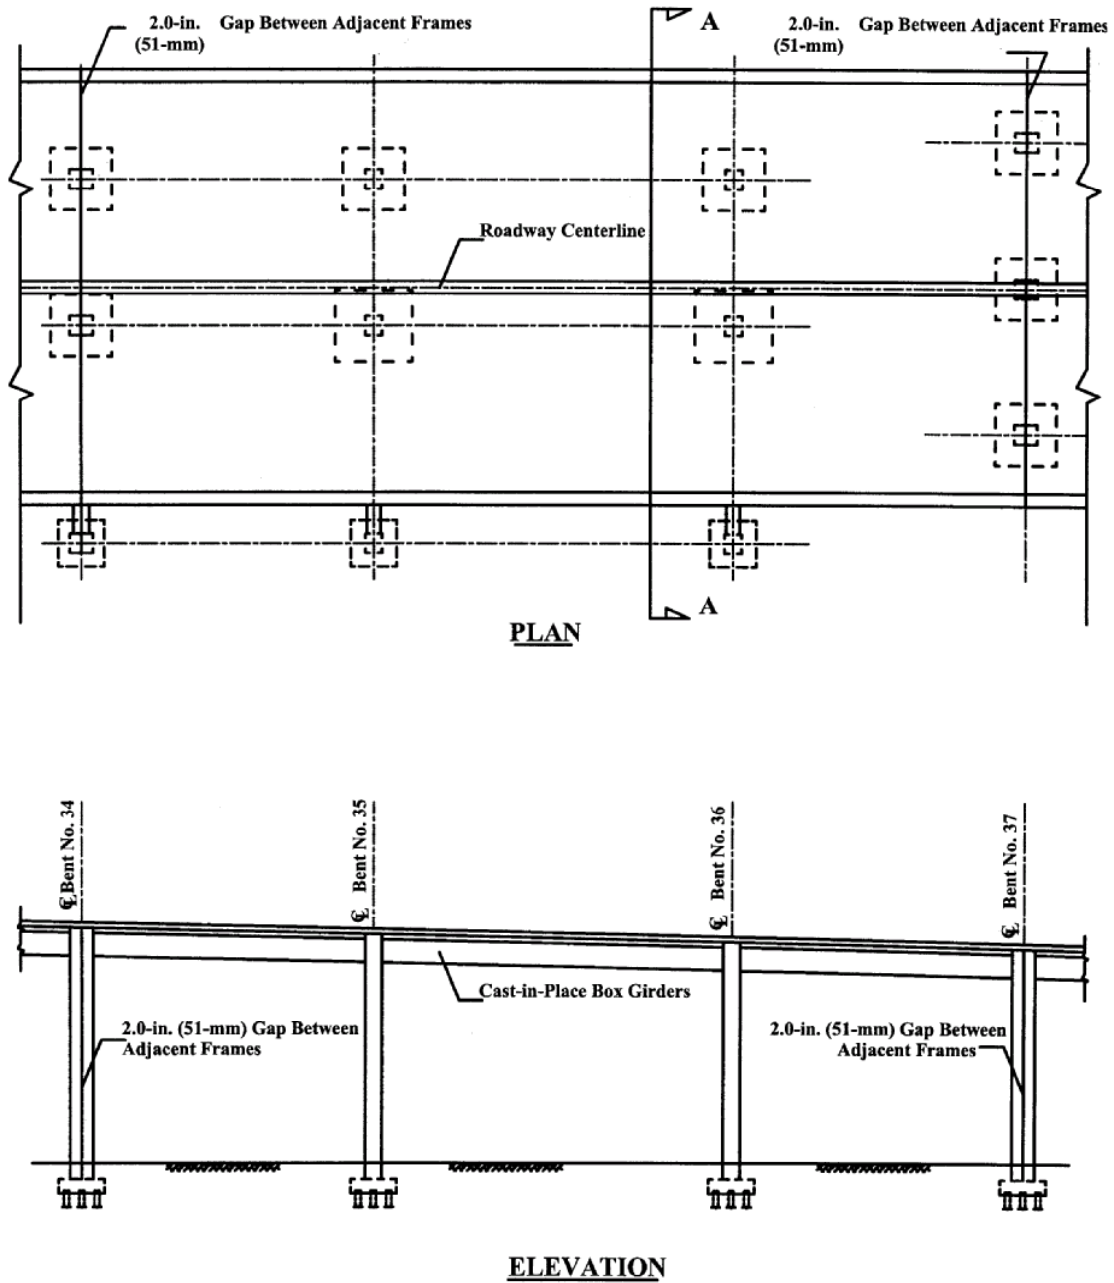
A Typical Section in the SR 99 Spokane Street Overcrossing, Plan and Elevation
